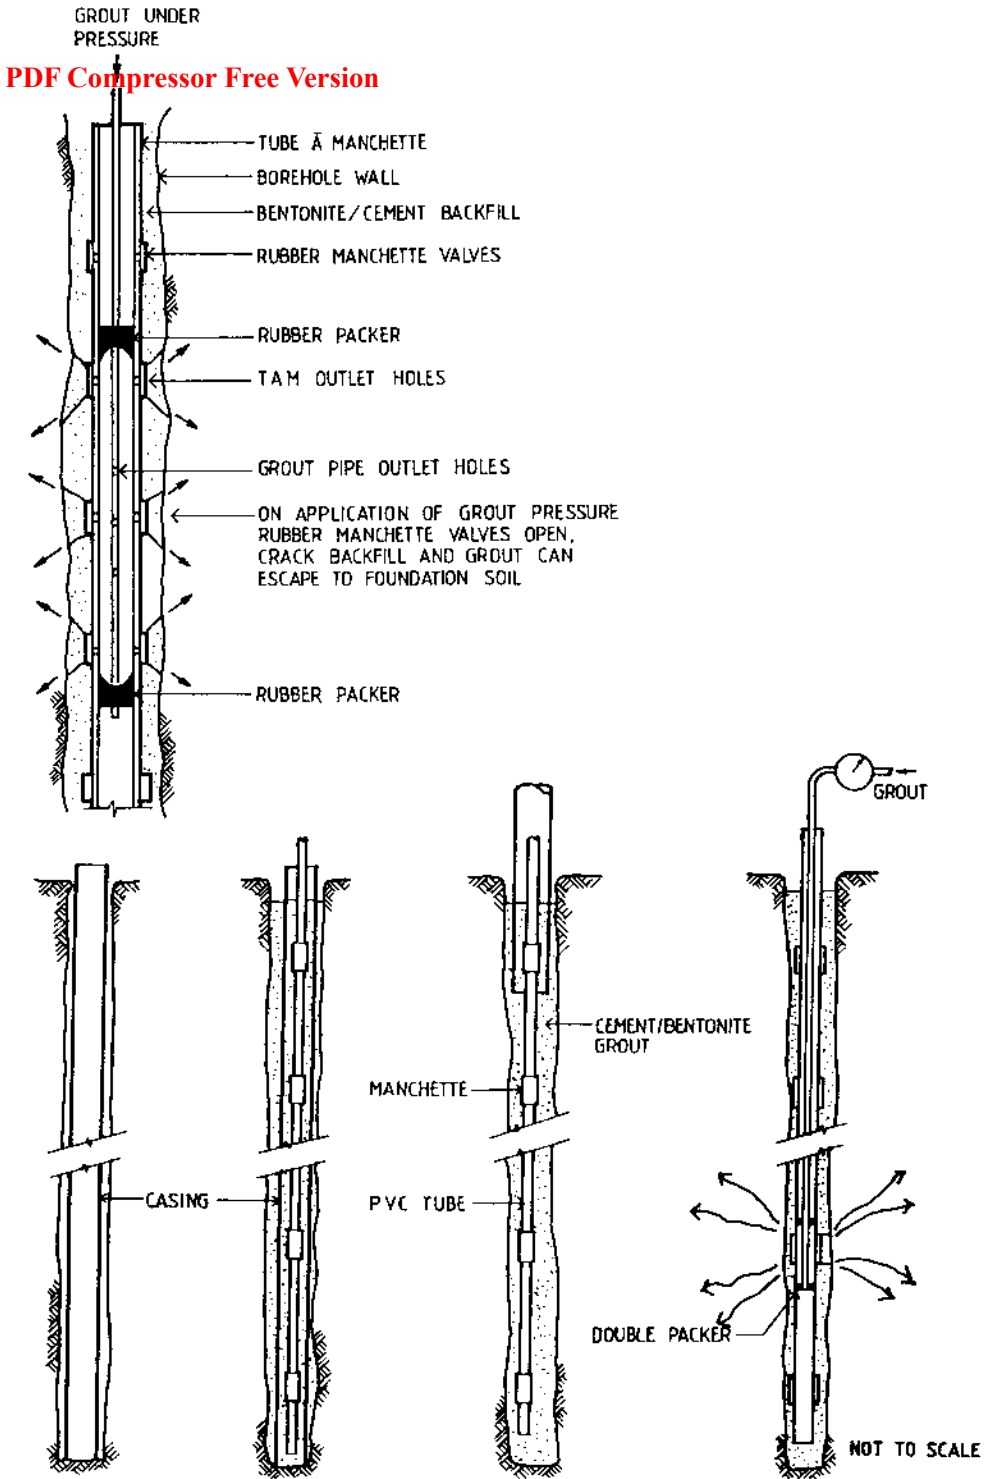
Tube-a-manchette grouting system (adapted from Brett 1986).
